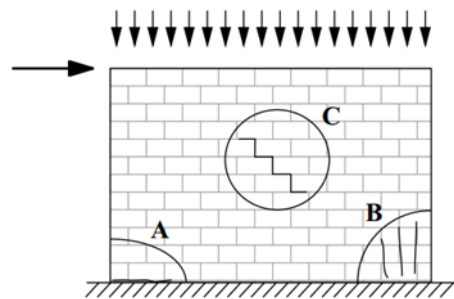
Different types of failure that can occur in masonry wall (Lang, 2002).
